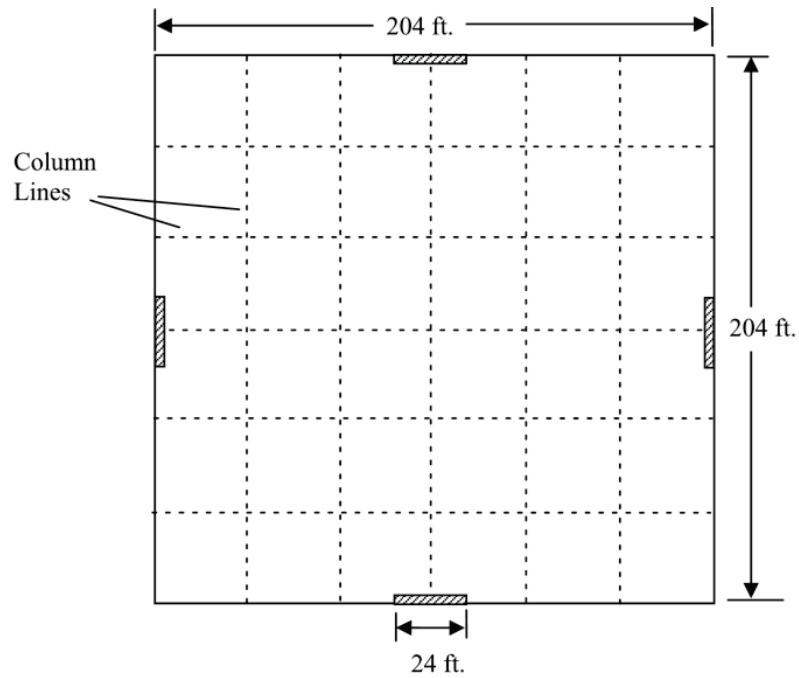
Reinforced masonry retail occupancy building from NIST GCR 10-917-8—plan view.
